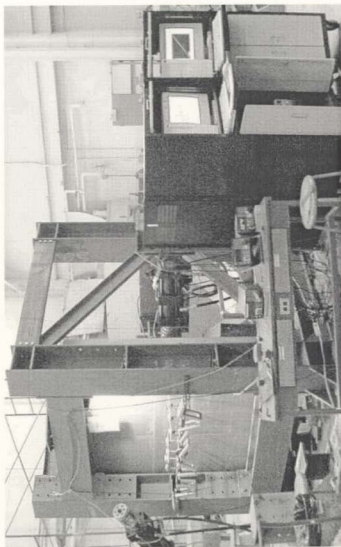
Layout of the test set-up with a centrally loaded specimen mounted in place
